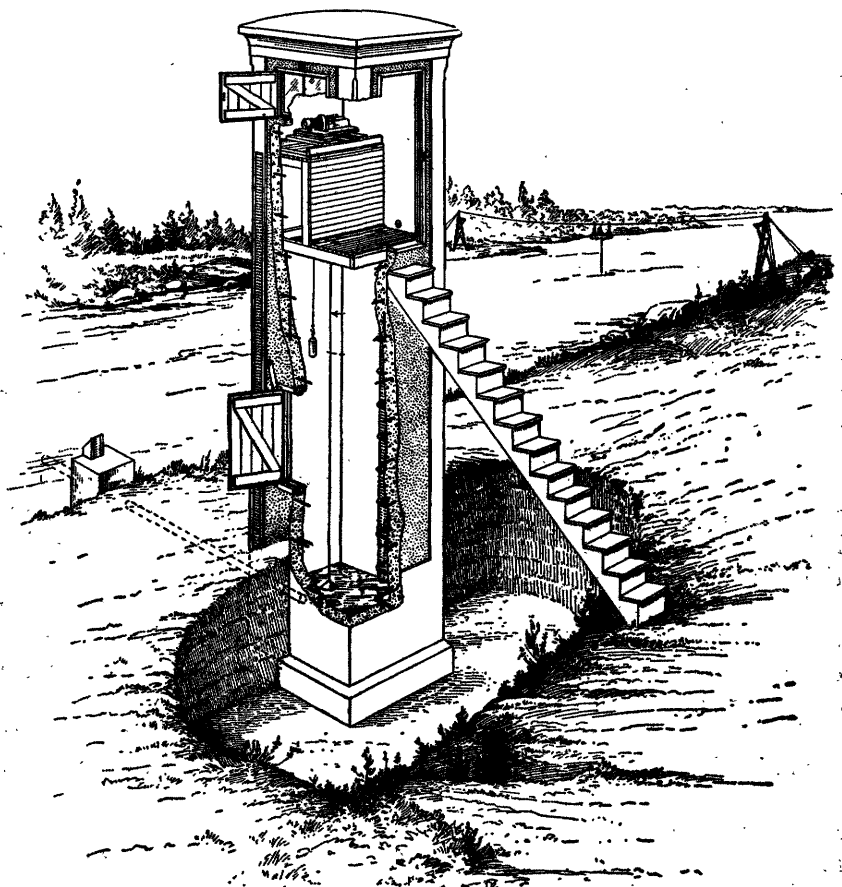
Typical river-measurement station showing concrete well and house for water-stage recorder and staff gages, cable, and car
